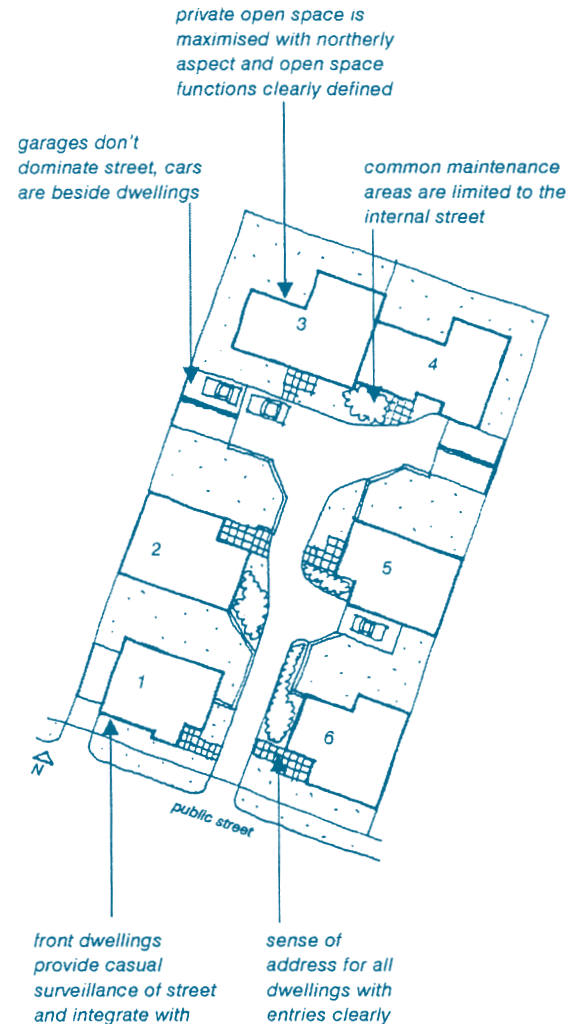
Consider image of development, amenity and ongoing management at the site layout stage.
